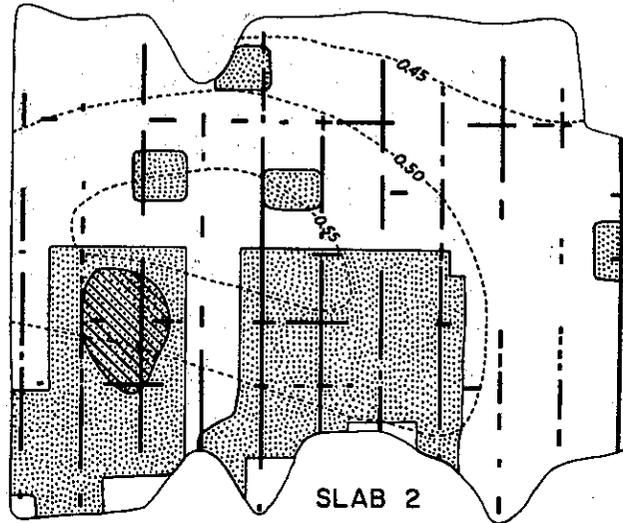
Slab showing severe cracking of soffit and epoxy patches.
